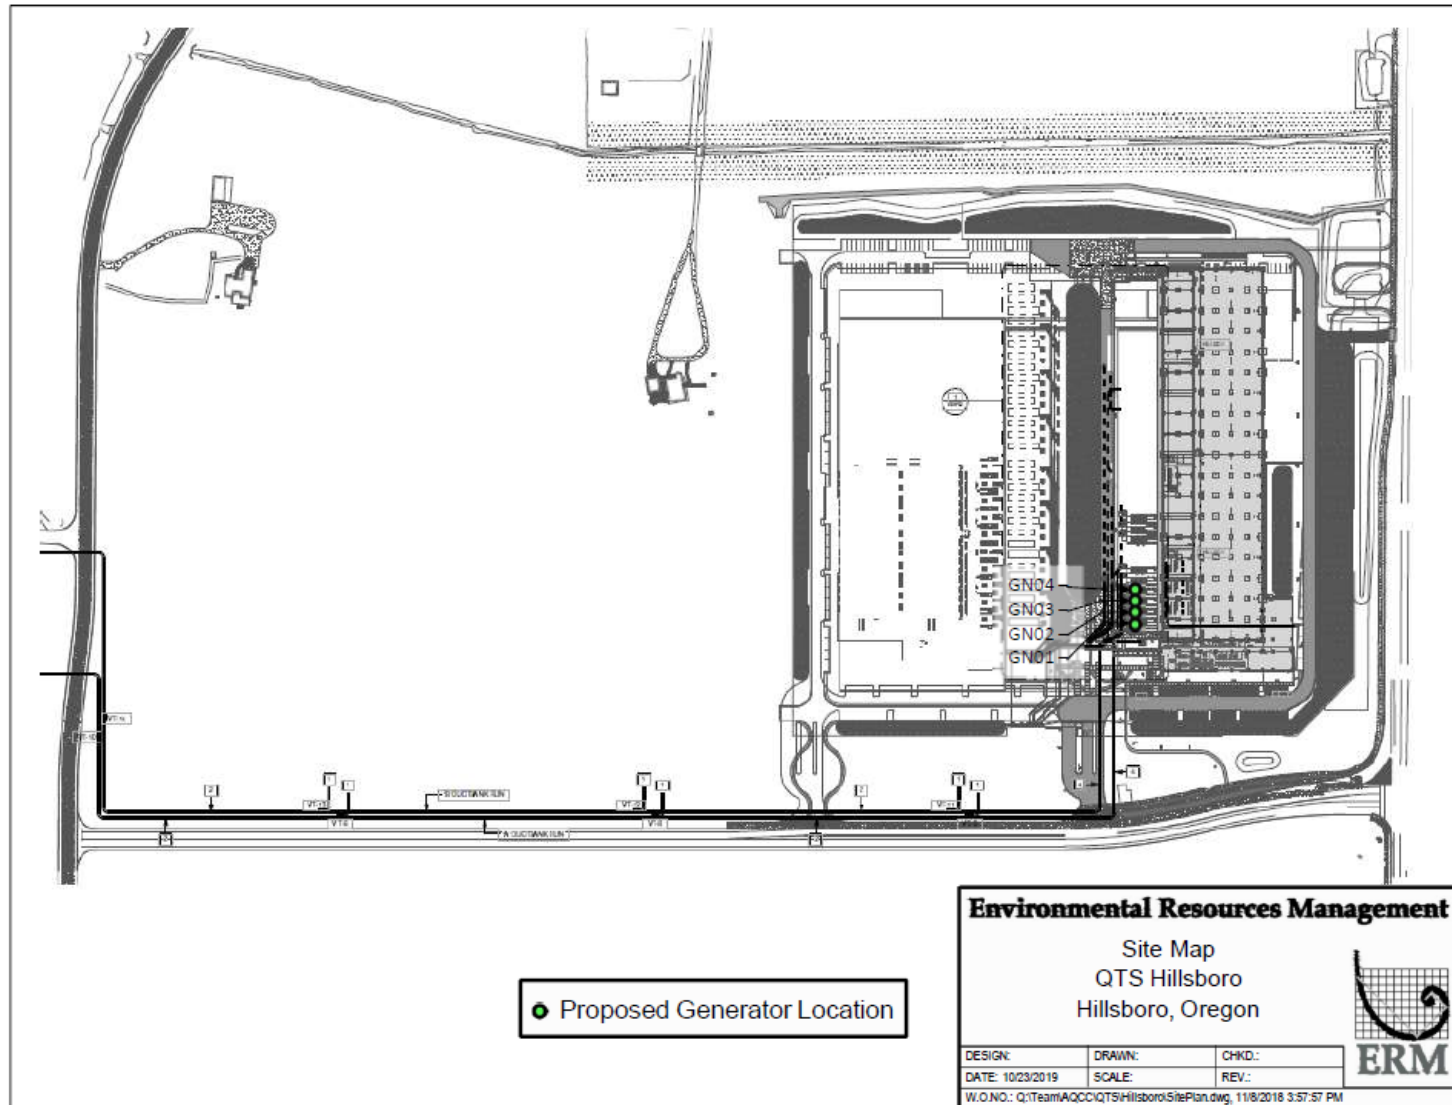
Proposed QTS Hillsboro Facility Layout
